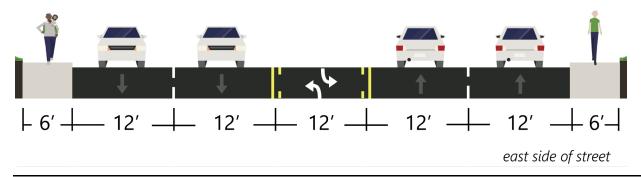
Typical Cross Section, Segment 5: 28th Street to 39th Street (looking north)
